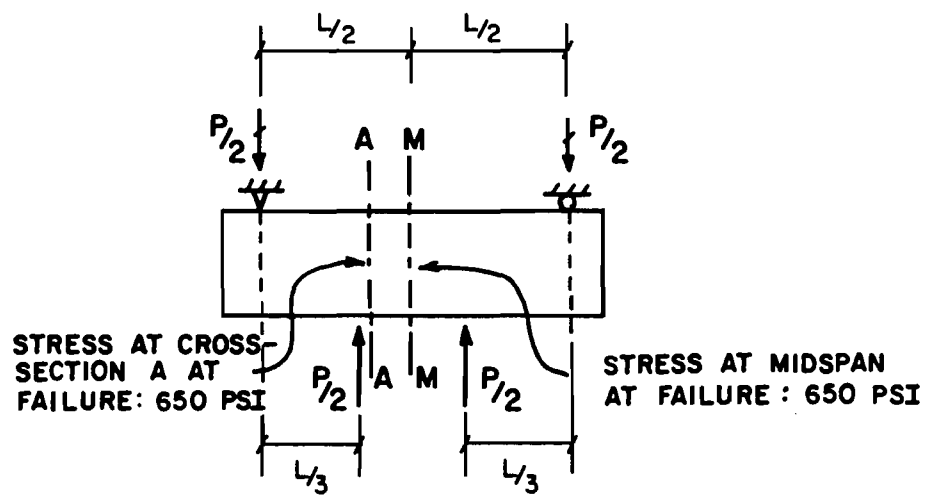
Beam tested in third-point loading; failure occurs at cross-section A at 650 psi.
